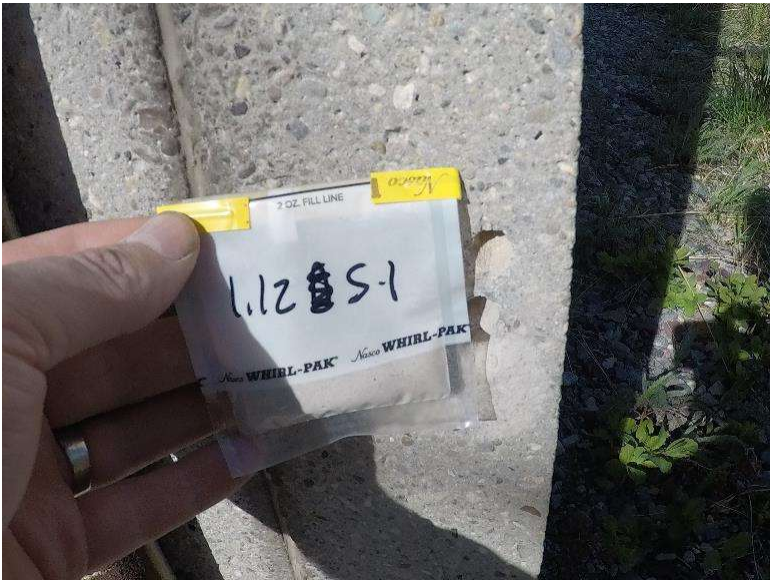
Site 1.12 Solar Building #1 Asbestos Samples 1.4-A13, 1.4-A14, 1.4-A15, None Detected.
